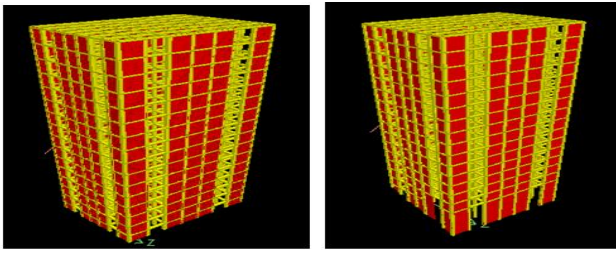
Building with combined straight, L and C shape shear wall on plain and sloping ground.
